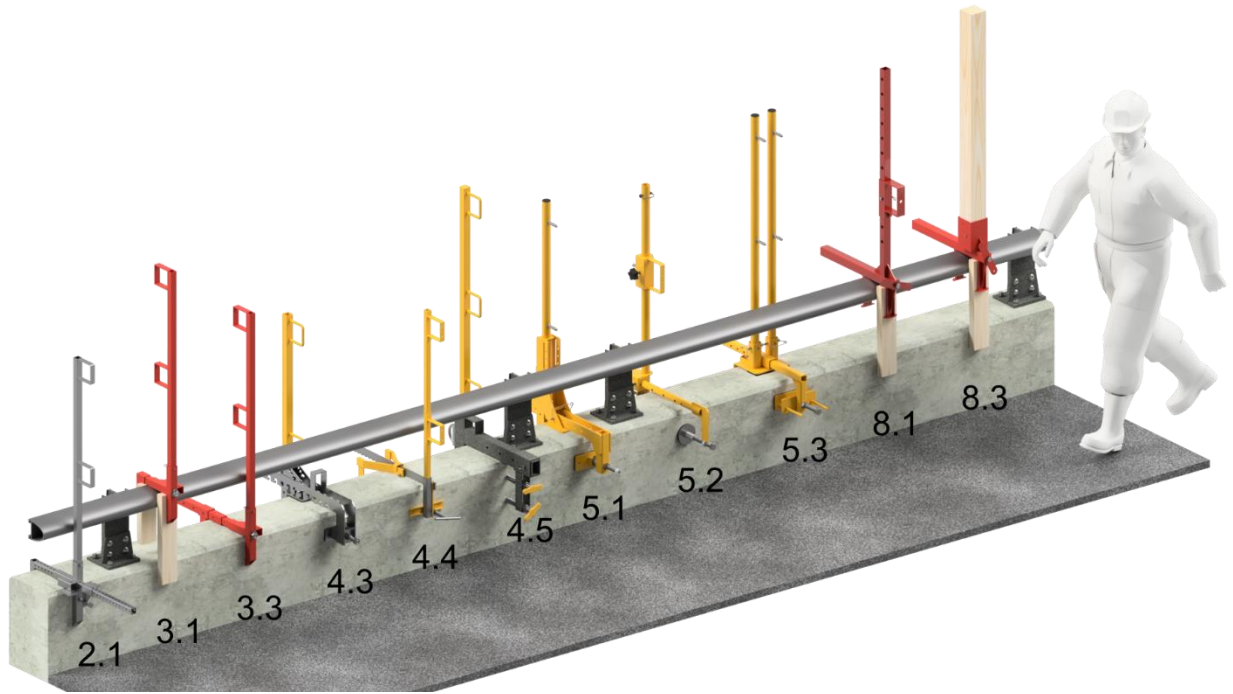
Compatible FPSD with bridge guardrails in North Carolina.
